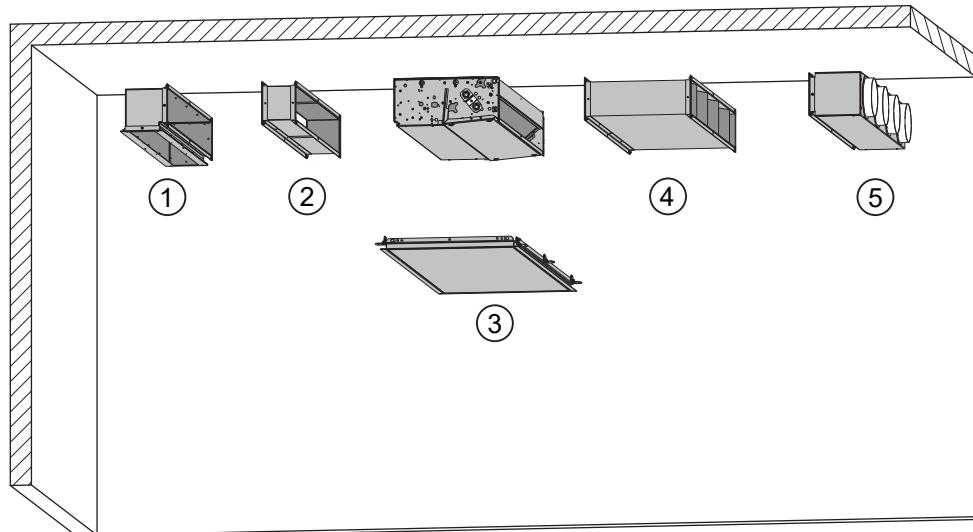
Schematic layout of steel sheet accessories for ceiling mounting
